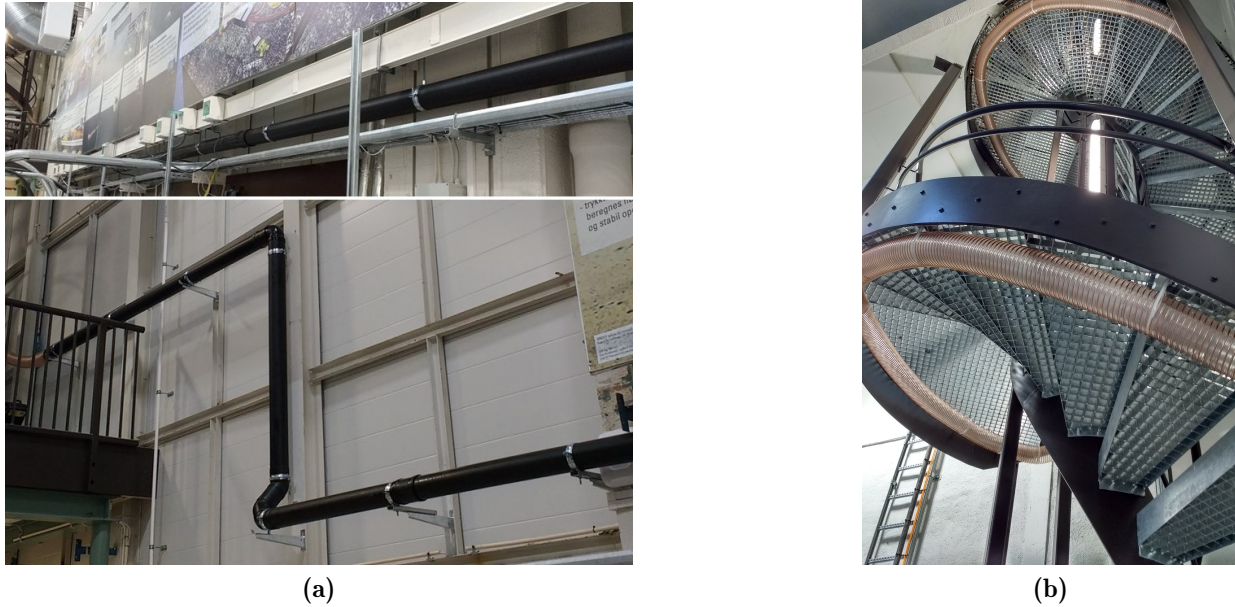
(a) Rigid drainage pipe , (b) Flexible drainage
